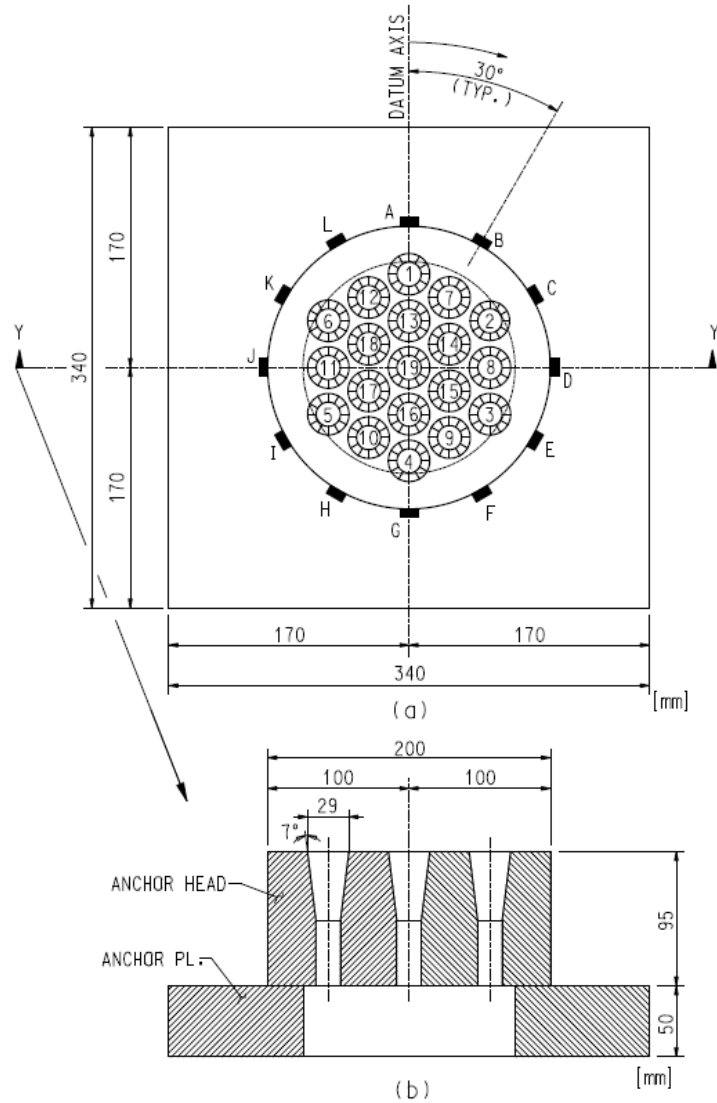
E 6-19 anchorage details: (a) top view; (b) section Y-Y
